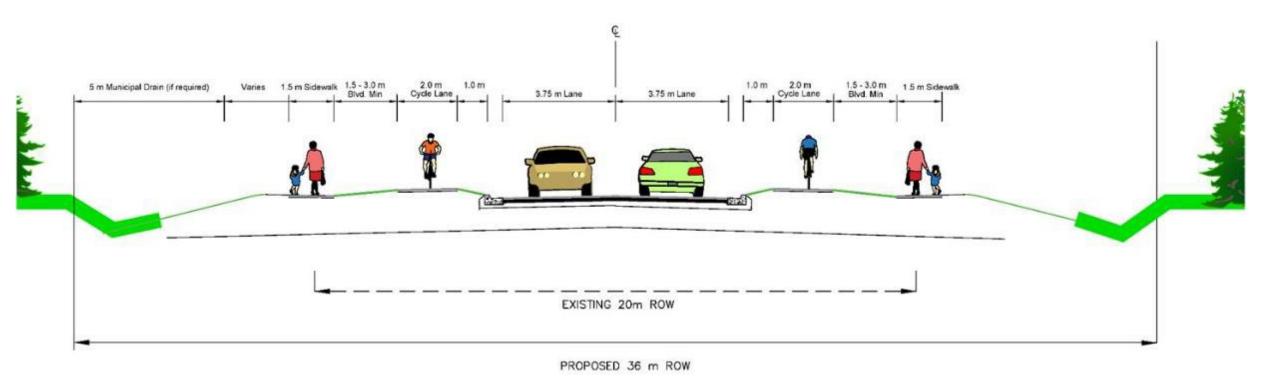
Concession Roads 8 and 9 – Alternative 2 - 2-Lane Urban Cross Section with Cycle Tracks and Sidewalks and/or MUP
